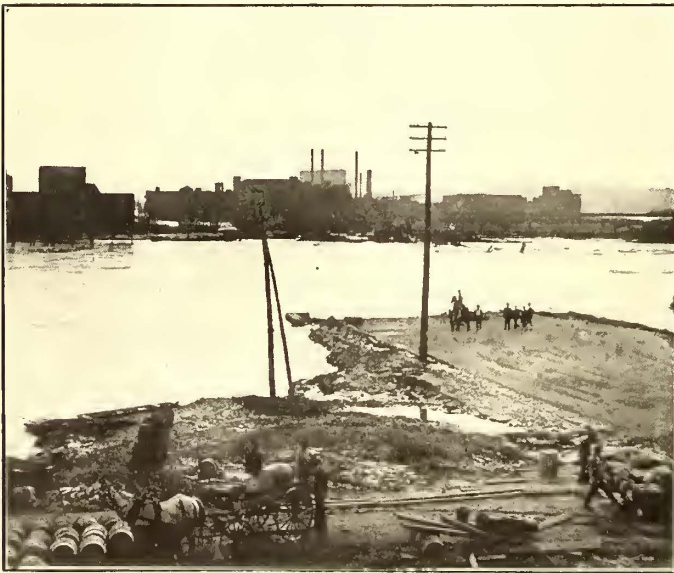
FORMER SITE OF KANSAS AVENUE BRIDGE
